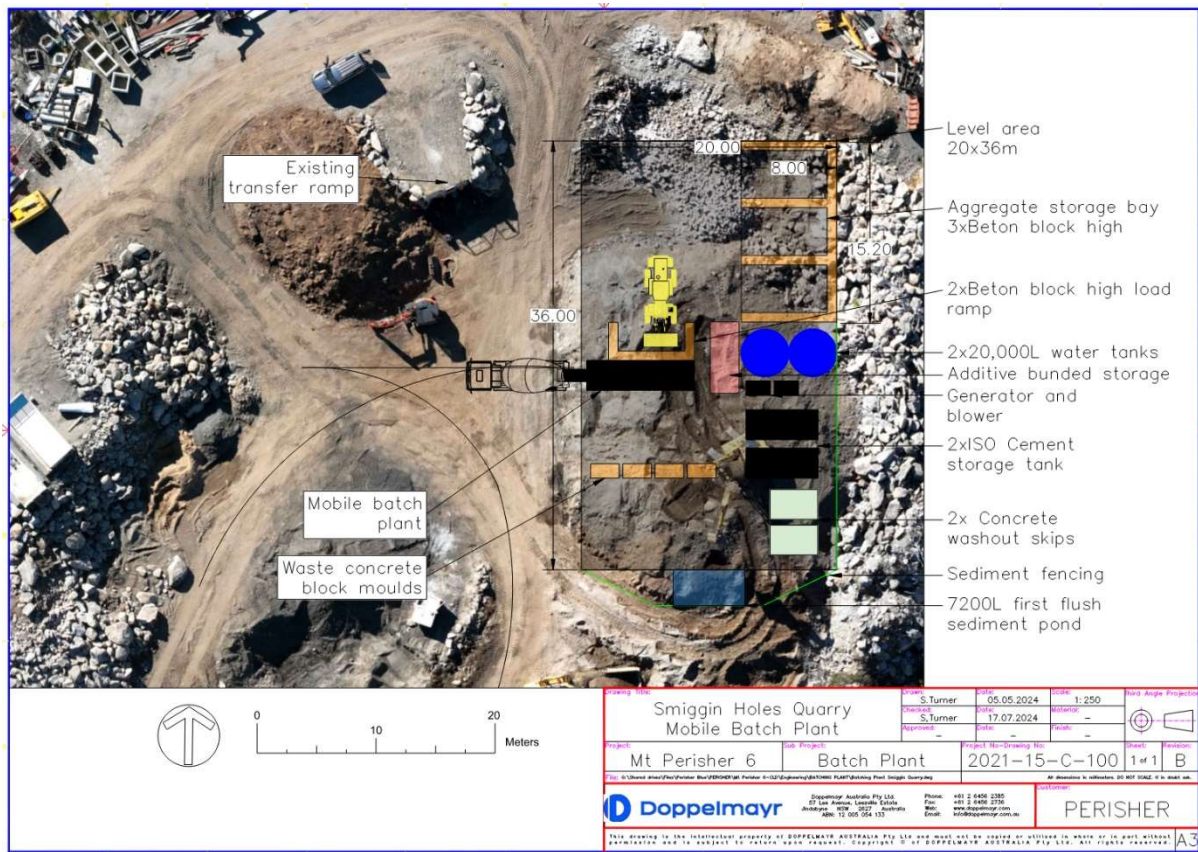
Site plan for temporary mobile plant at Smiggin Holes Stockpile Site
